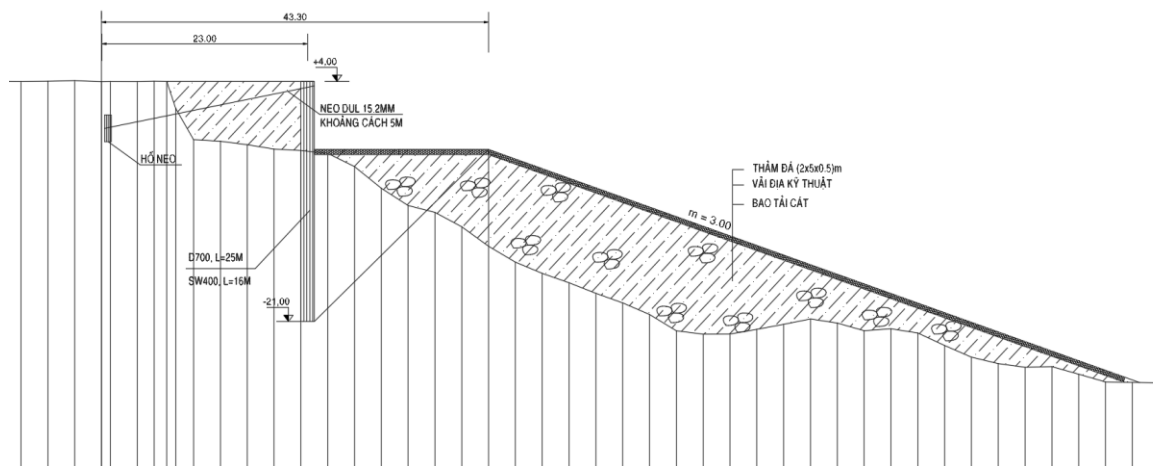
Cross section jointly arranged with semi-continuous pipe-sheet pile wall, SW400+D700x110.
